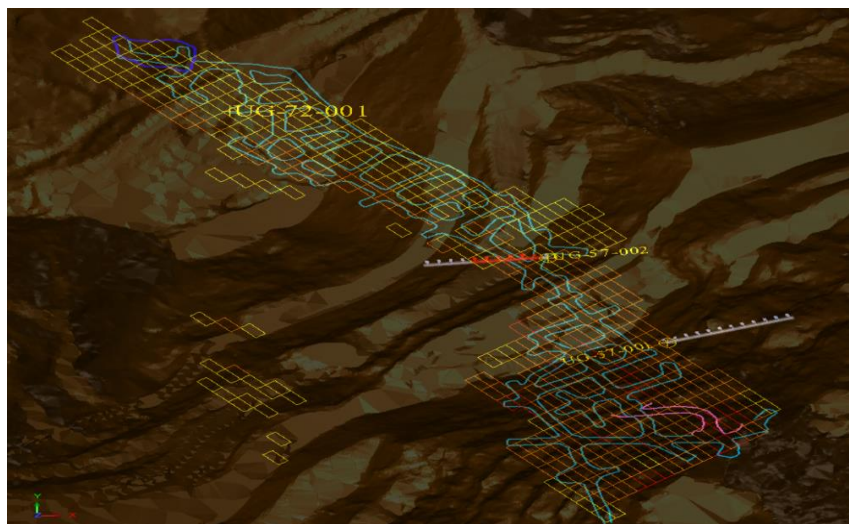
Drill hole location at level -57 & -72 overlay with tunnel as built and Mineable Shape Optimizer
